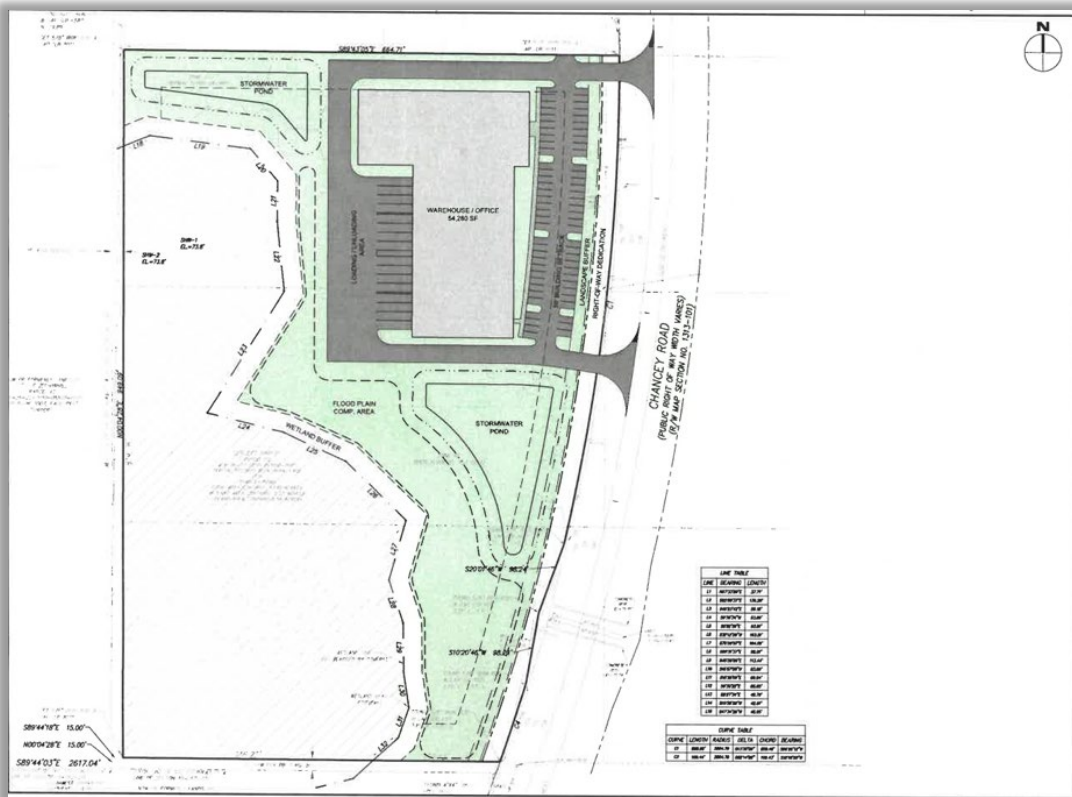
Proposed Preliminary Conceptual Plan (As of January 2025) Courtesy Dewberry Engineering
